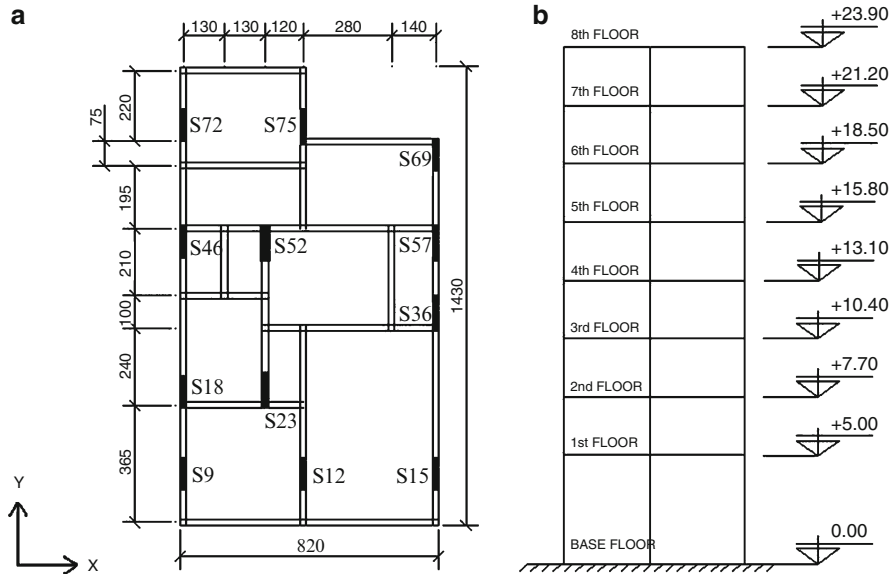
Eight-storey building configuration. (a) Plan view (cm) and (b) lateral view (m)
